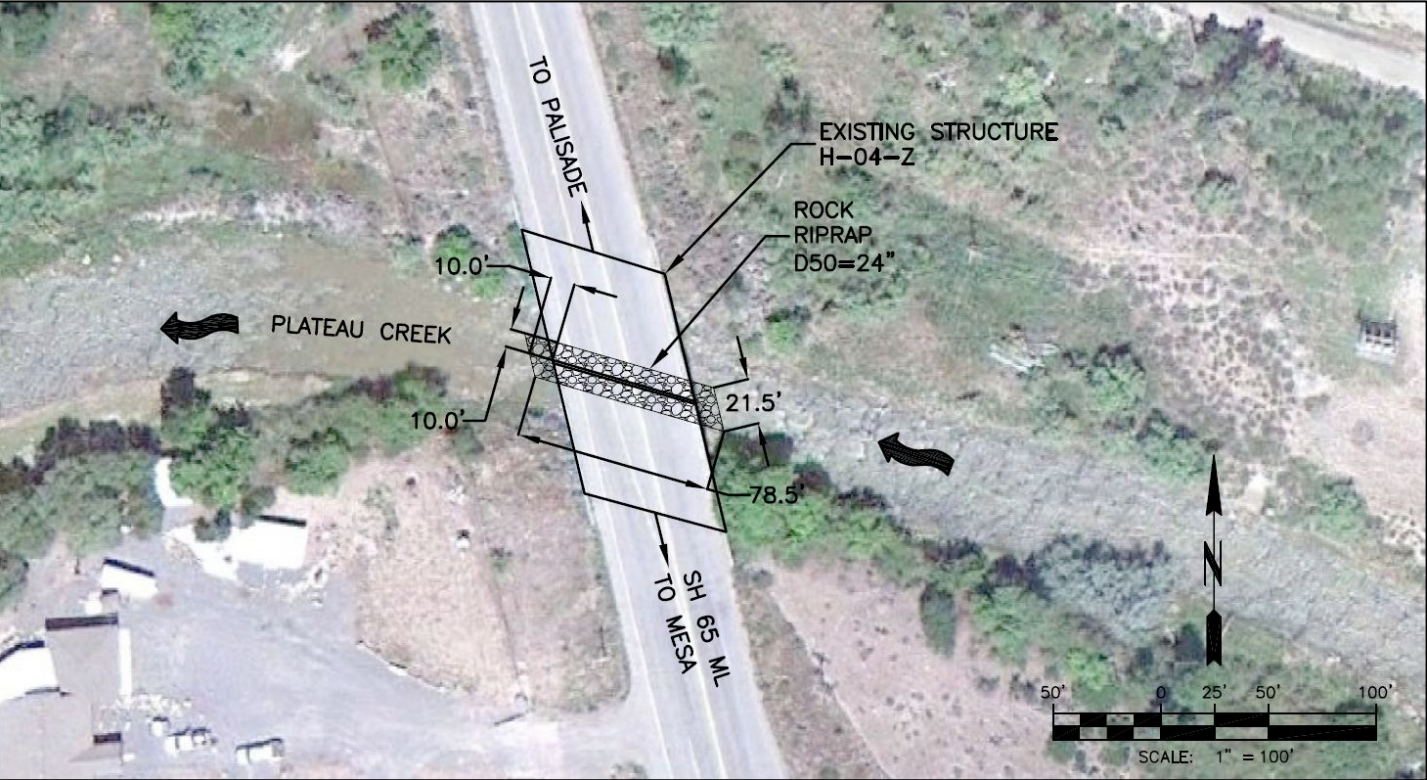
Plan view of Bridge H-04-Z with recommended hydraulic scour countermeasure locations
